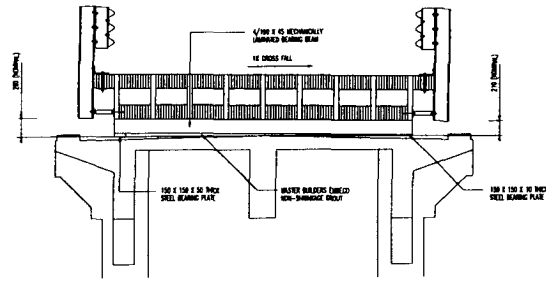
Typical Cross Section - Cellular Deck overlay over existing concrete decks.
